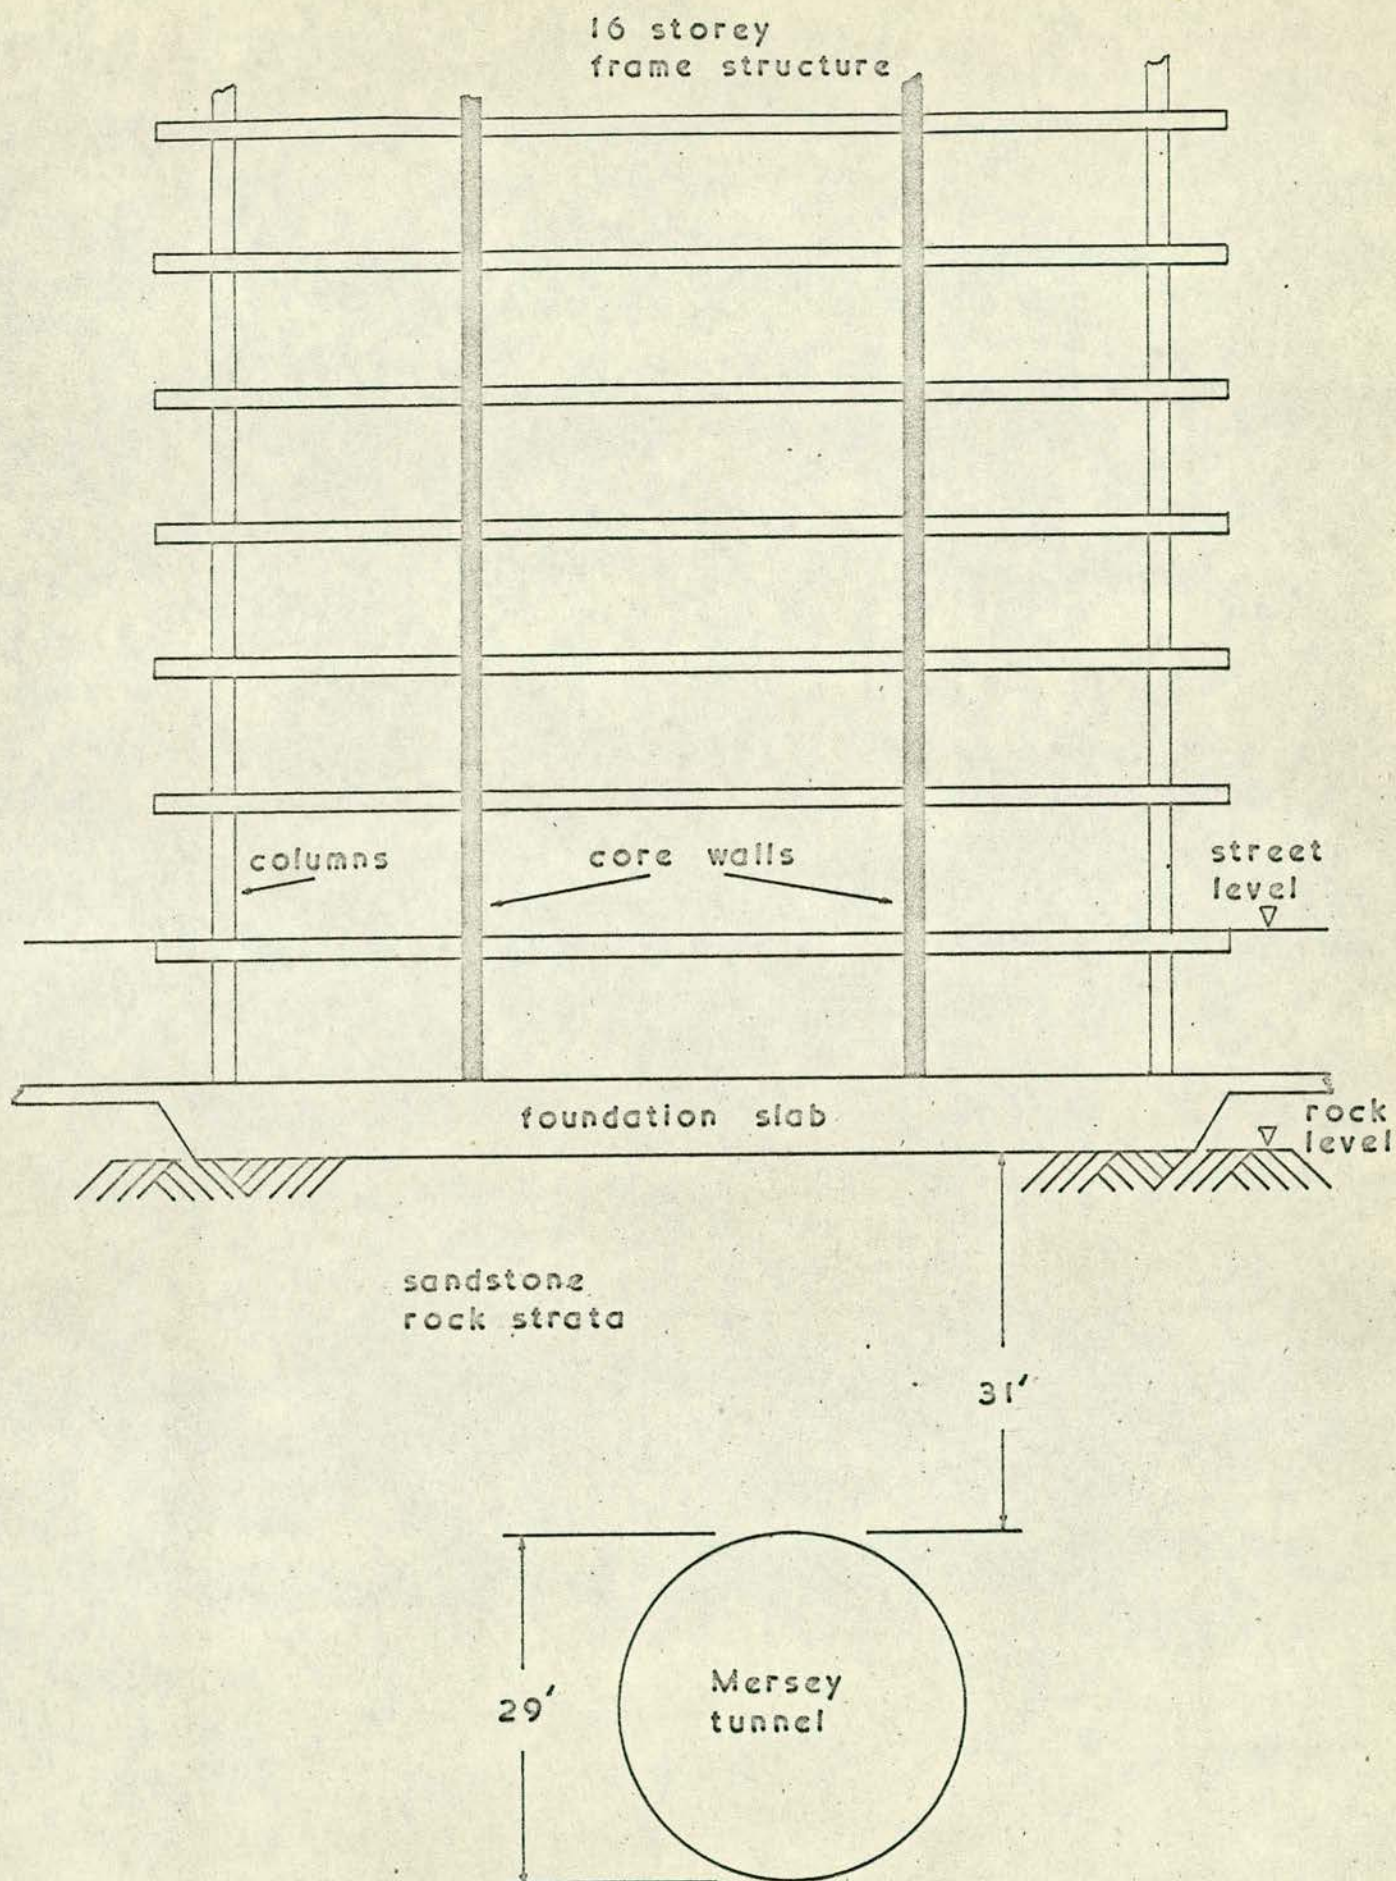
ORIGINAL FOUNDATION SCHEME
